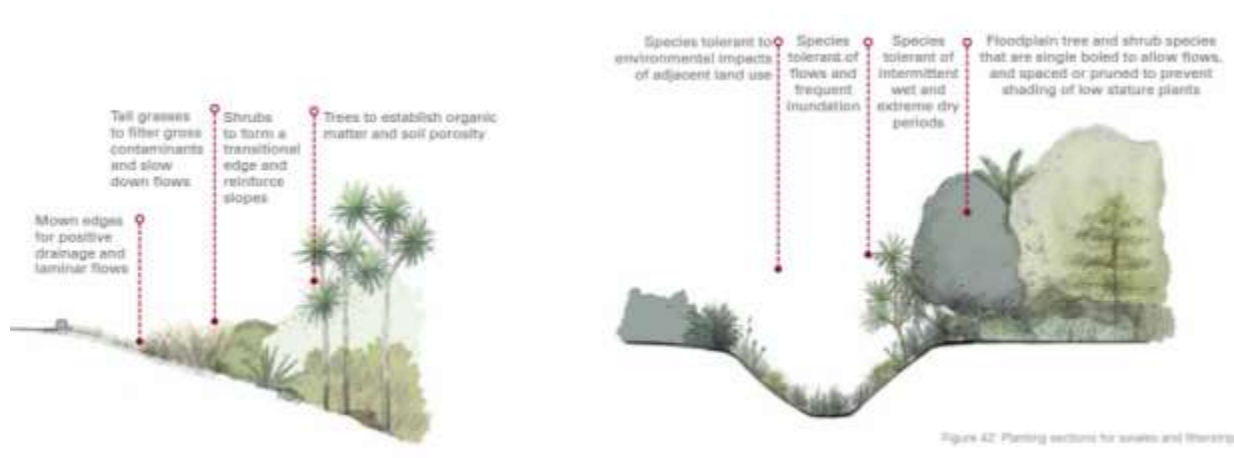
Cross-sections of a filter strip (left) and swale (right) (Lewis et al. 2009).
